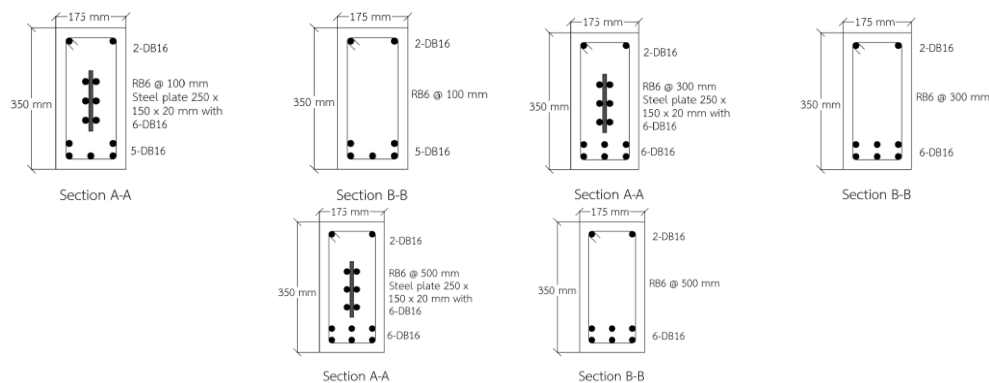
Cross-section of the beam specimen with deformed bars welded to steel plate: Group 1 to 3.
